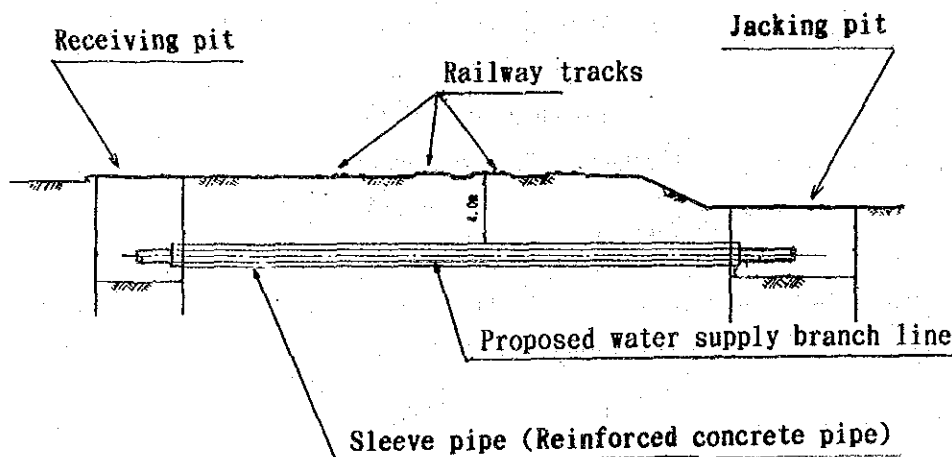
Sleeve Pipe Jacking Method for Railway Crossing Section
